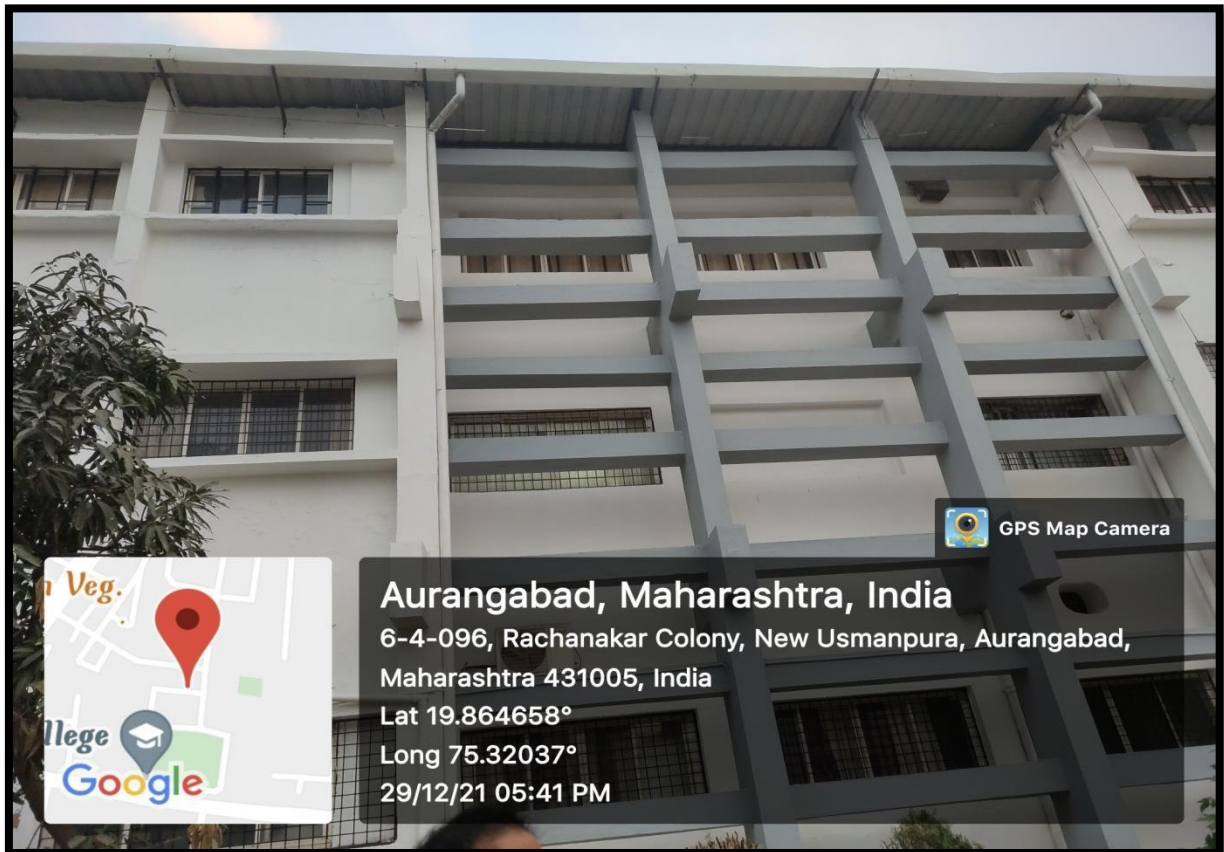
and 12 - Rainwater Conduit Pipelines on College building
